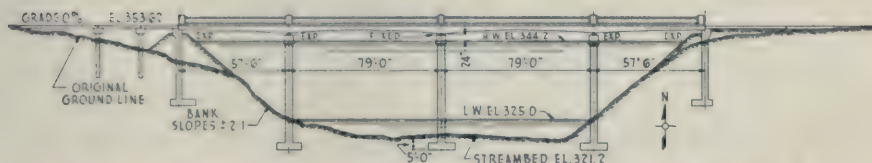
Four-span symmetrical T-girder bridge—Layout Problem No. 2.
